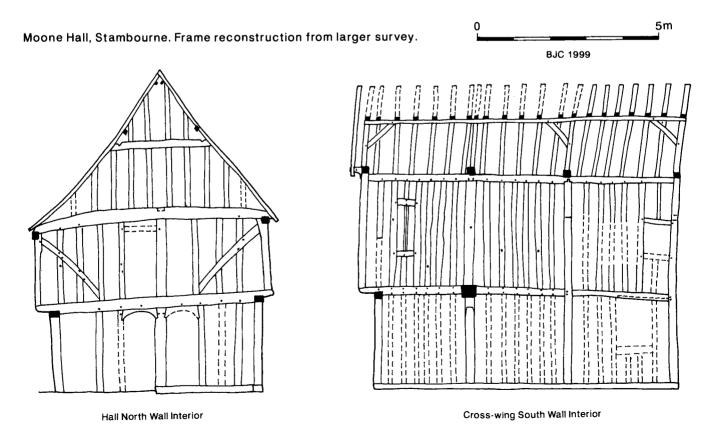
Stambourne, Moone Hall, reconstructed elevations of the timber frame
